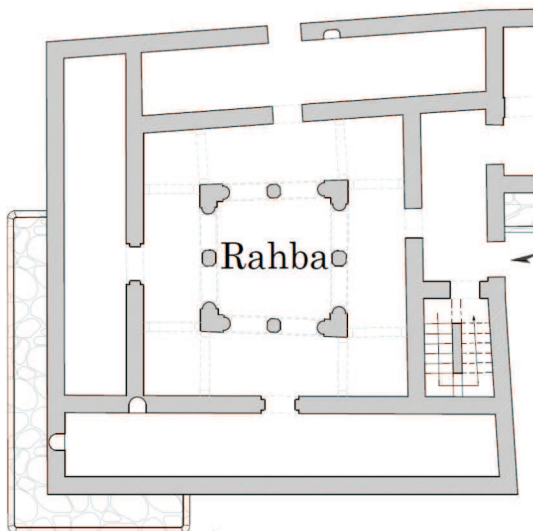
Plan D'wayriyyet Ahl Essanhour.
